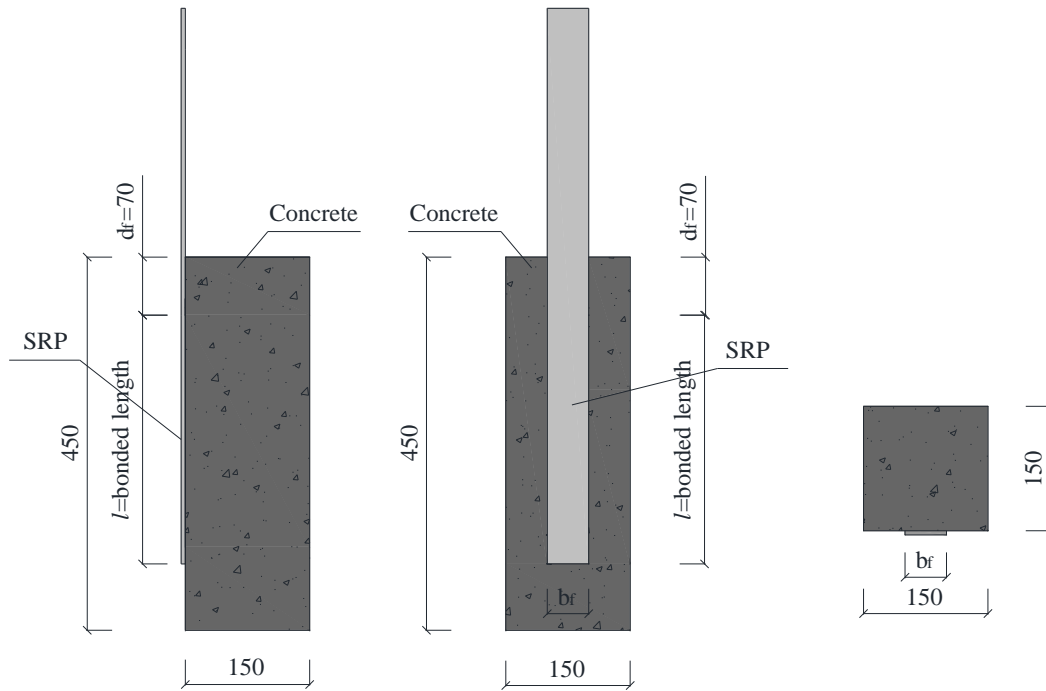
Specimen Dimensions and Details of Bonded SRP system (concrete specimens).
